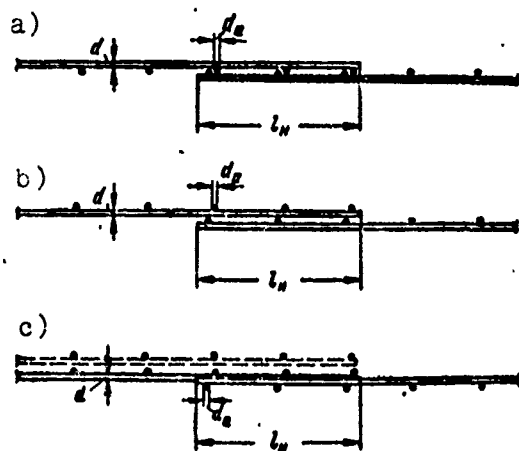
The lapped joints of welded grids (without welding) in the direction of the working reinforcement when making the latter from round (smooth) rods. a - the distributive (transverse) rods are situated in one plane; b and c - the distributive rods are situated in different planes.
